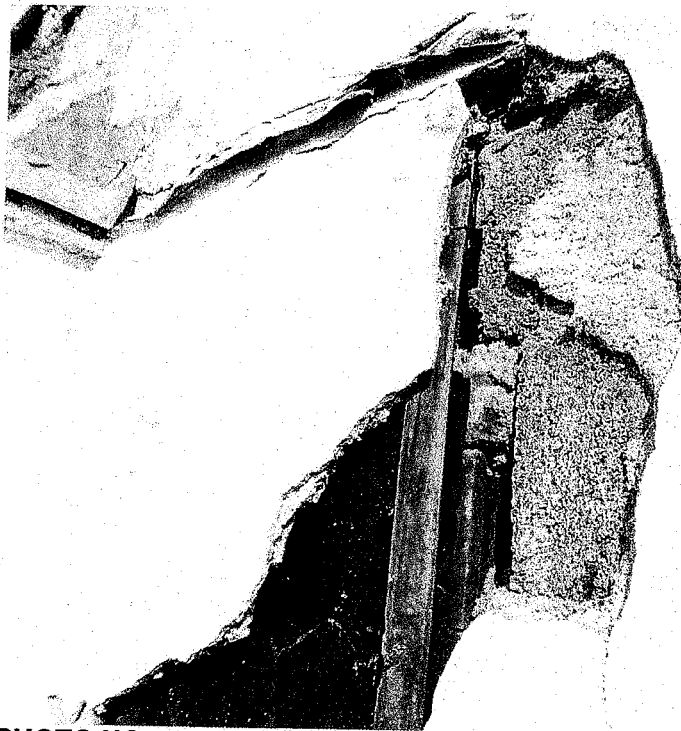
Priority Repair 4 – Bulging and spalling of parge coat behind steel column position – South Elevation, Grid 1-5: El. 0'-20' +/-
